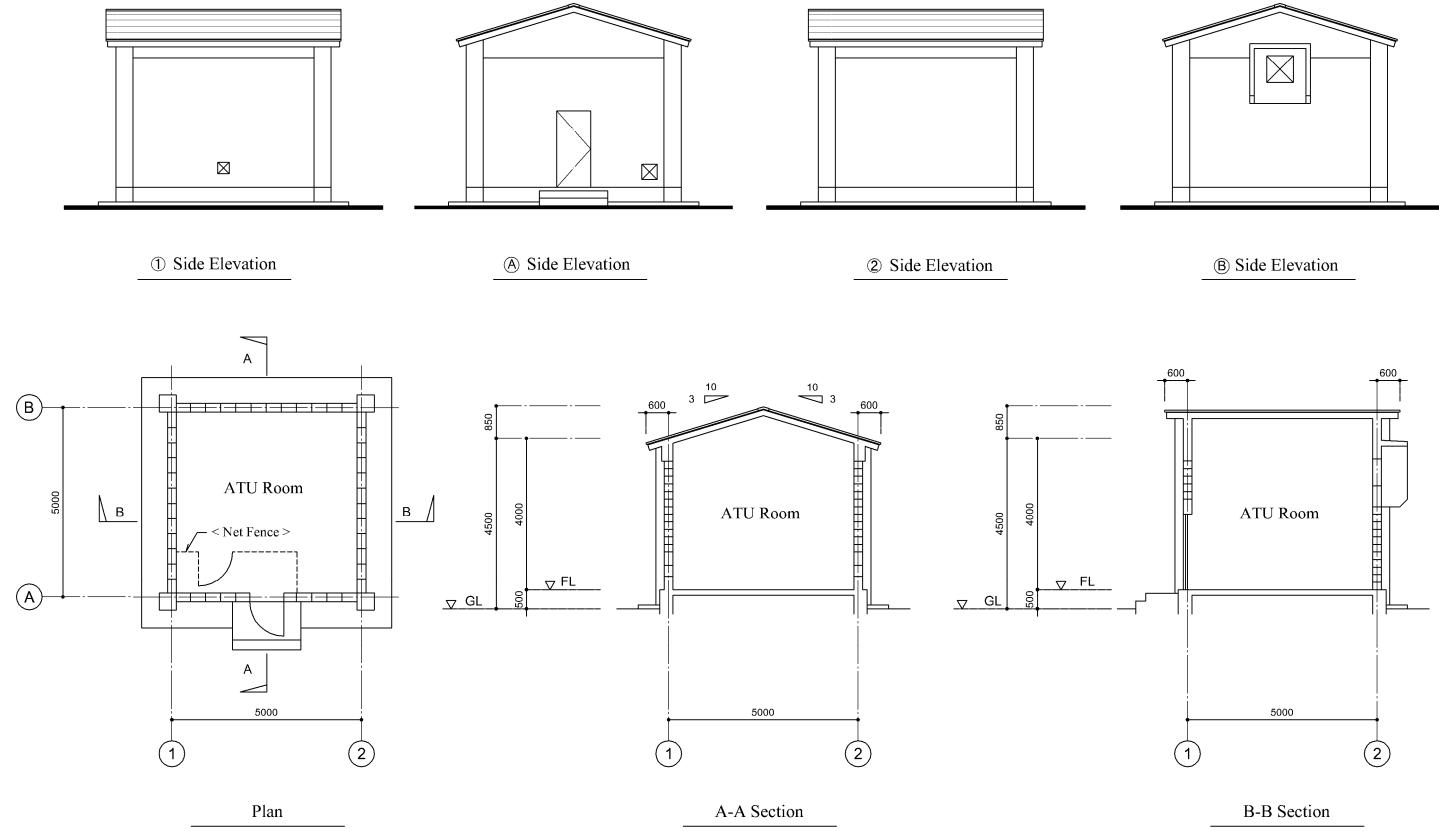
Mawagga and Kyeriba MW Transmitting Stations Main ATU Hut / Plan, Elevations and Sections
